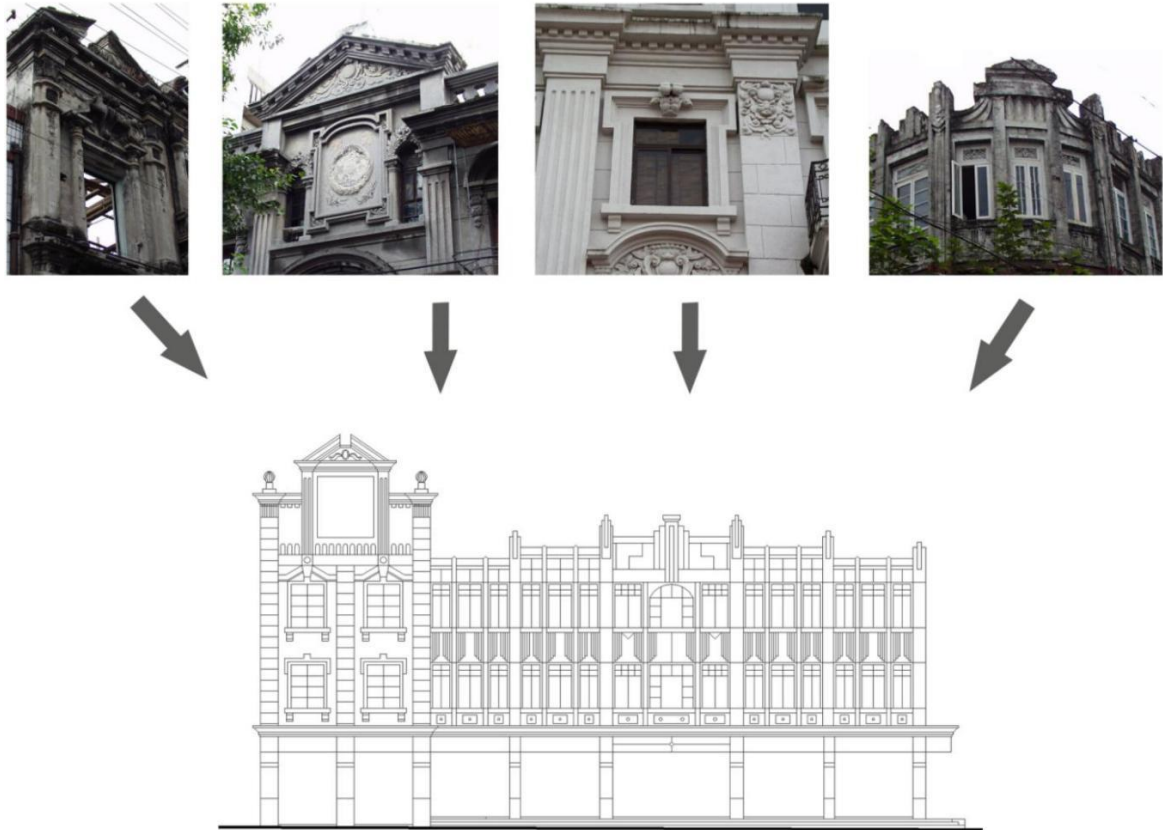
A new building of Wuma Street was originated from other existing historic buildings.
